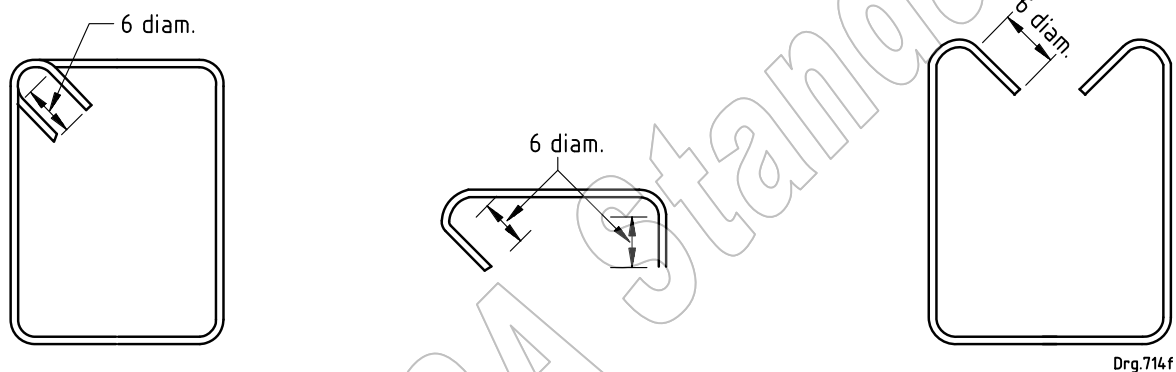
Stirrups with seismic hooks and stirrups using cross ties over open stirrups
